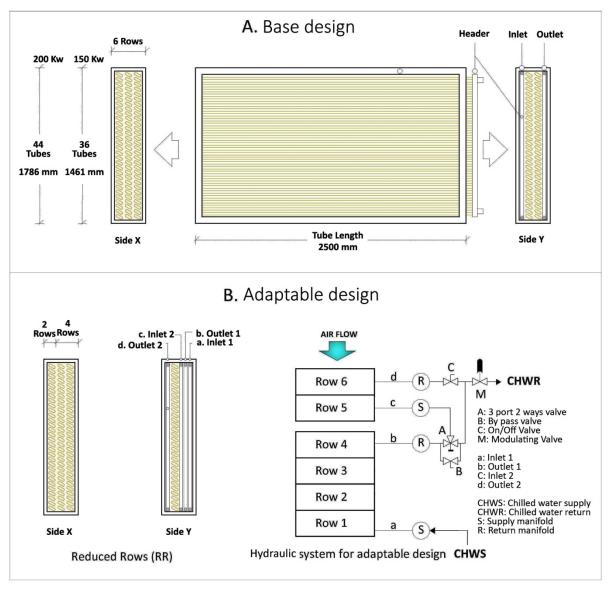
Configuration of a typical full circuiting cooling coil a) base design and b) adaptable design
